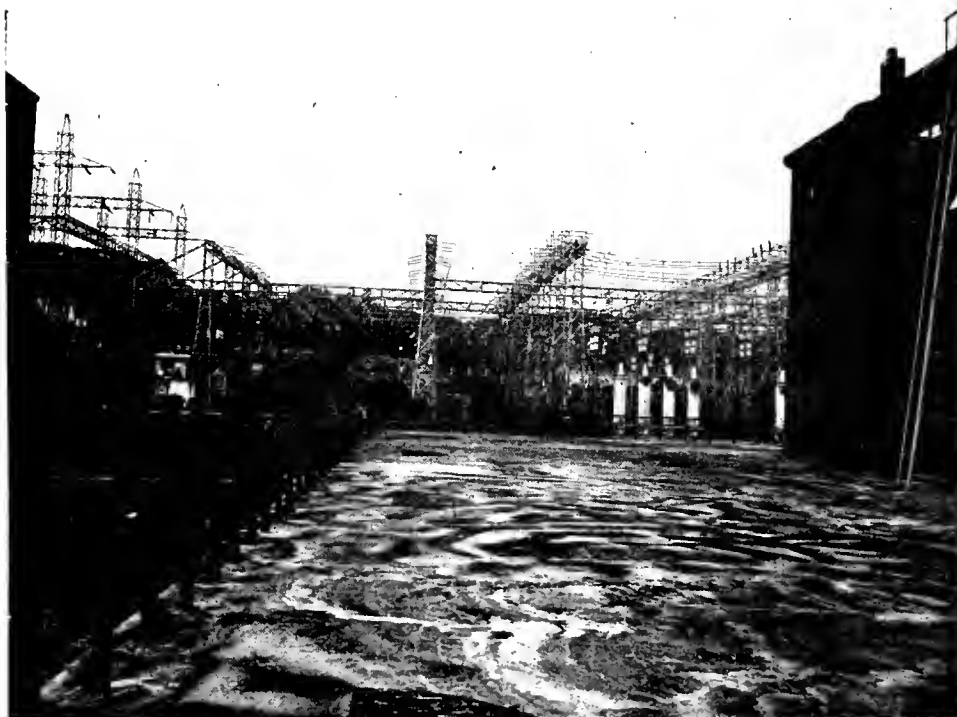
Kawabe Plant—Outdoor switching and transformer station taken from top of penstock inlet. Note protection barriers around main transformers
